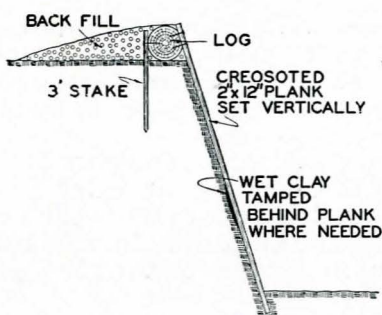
Heavy plank linings have met with success, if care is used to exclude the air behind the plank by tamping the space full of damp clay. The plank should be creosote treated.
